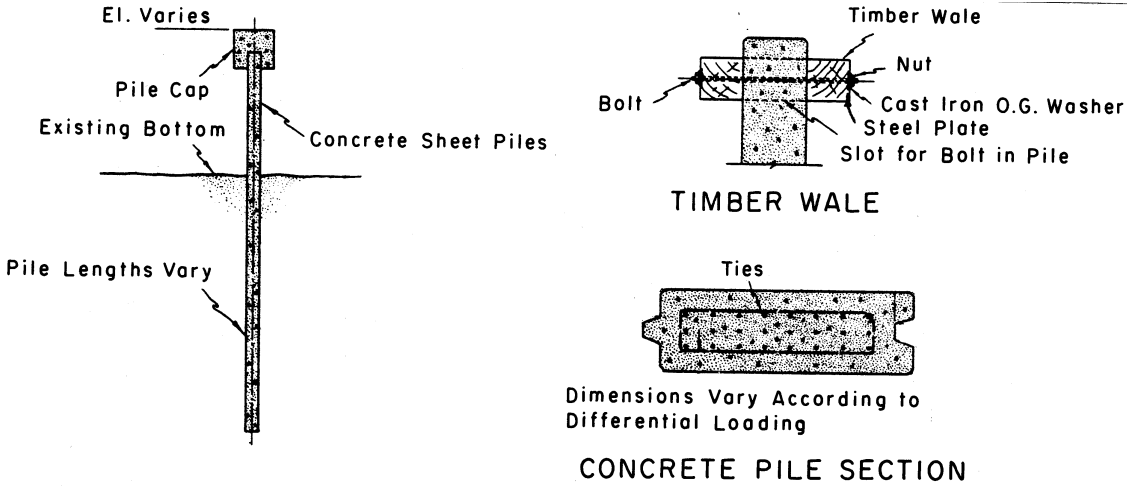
Prestressed-concrete sheet-pile groin, Dohney Beach State Park, California
